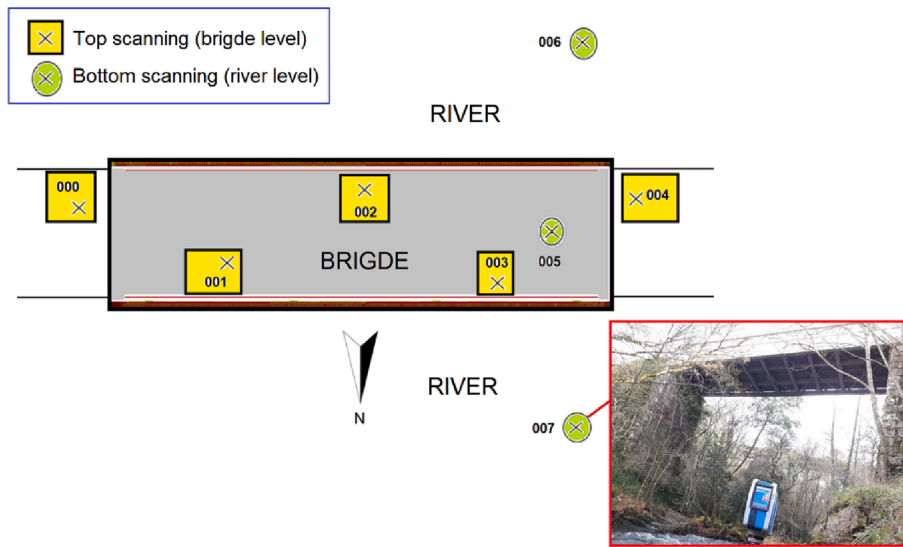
Scheme of laser scan positions (plan view of the bridge).
